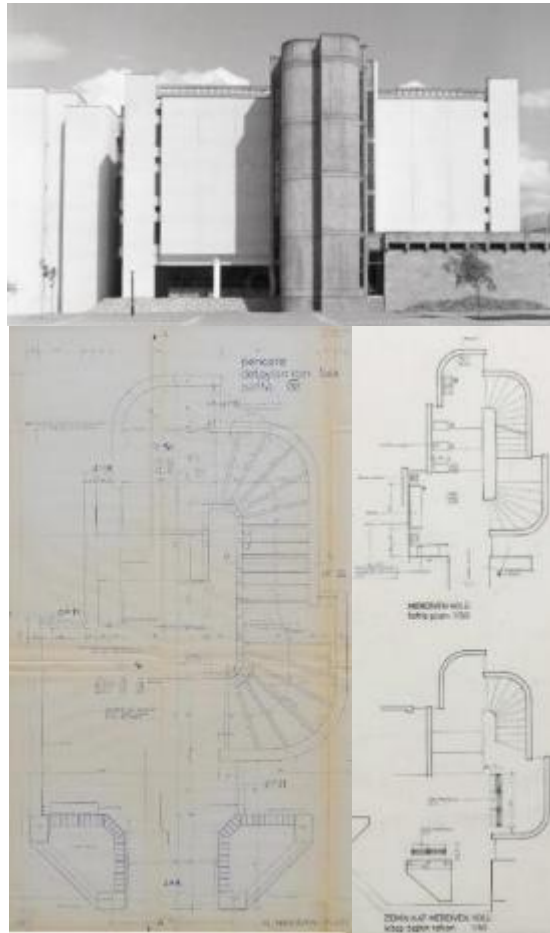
Stair shaft of the Library building will be modelled and re-drawn to be included in Archive Box. Exterior photograph (above) of the stair shaft attached to the library building and its construction-decoration drawings (below) (Salt Archives)
